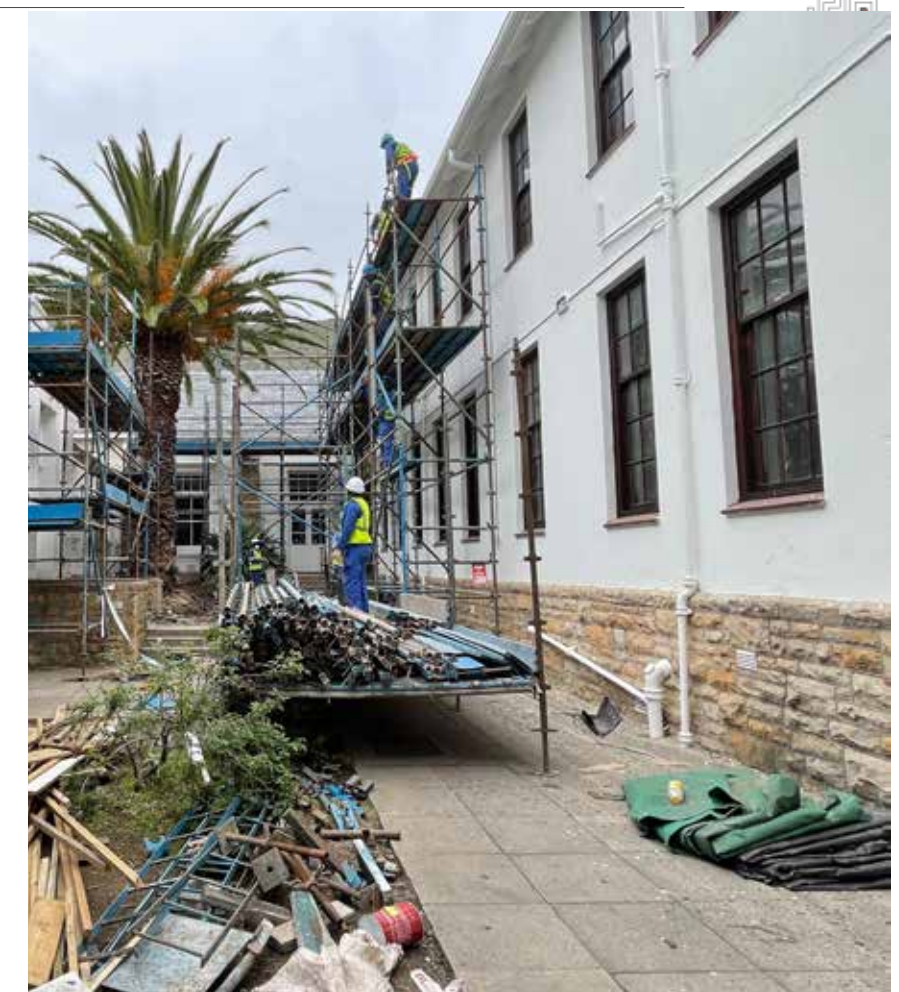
Character and conditions of school grounds near school building (RSA 2023)
